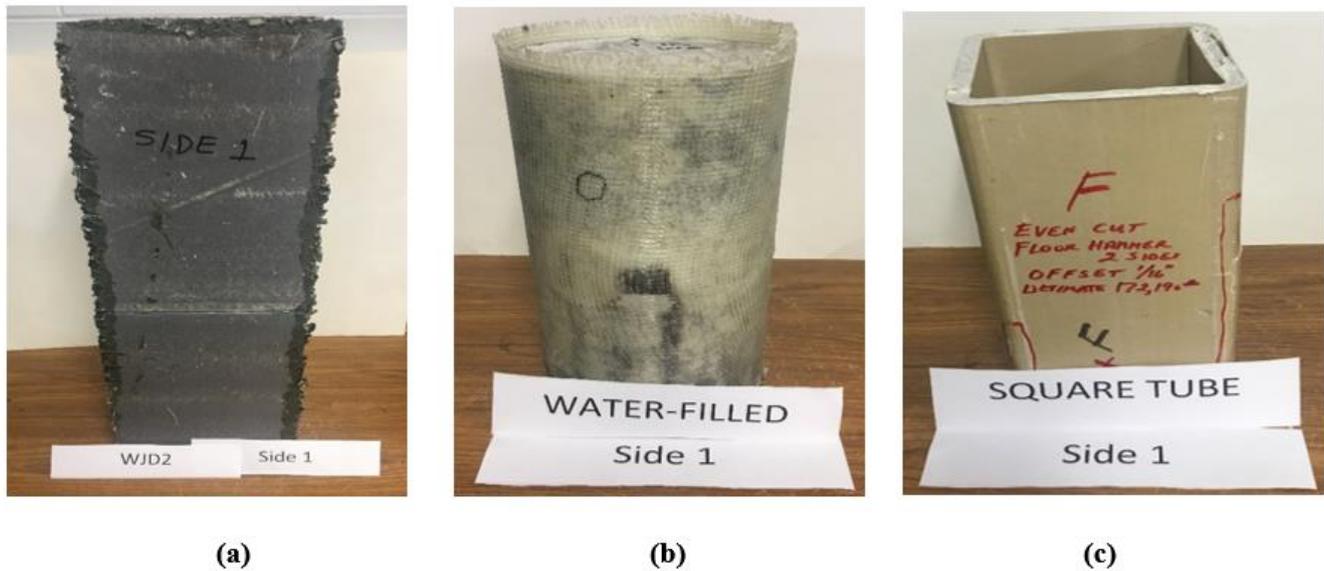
Laboratory specimens – (a) GFRP bridge deck (side without wearing surface), (b) GFRP composite wrapped concrete cylinder, and (c) GFRP square tube section
